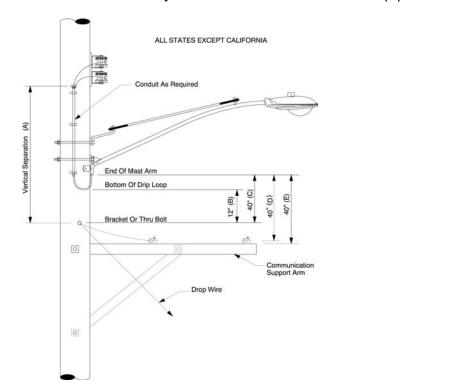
Street Lighting Facilities Above Communication Open Wire Crossarm
